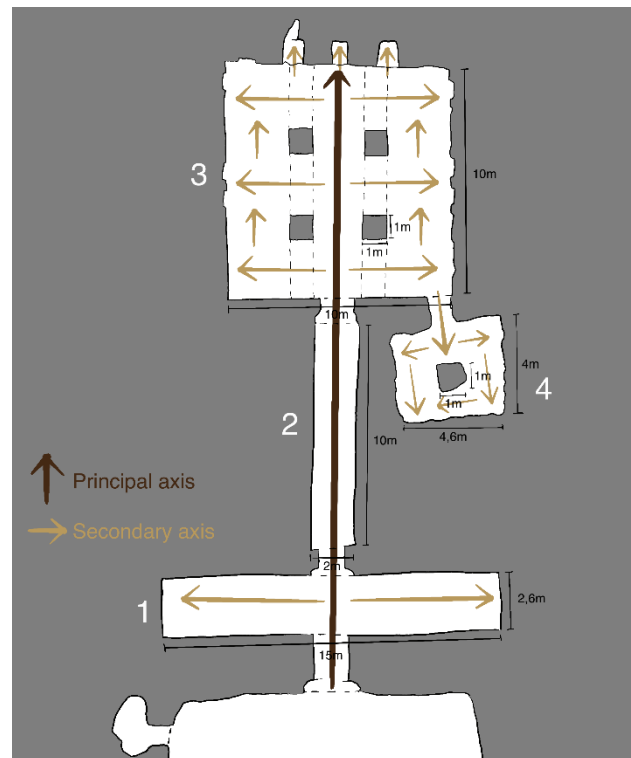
Plan with excavation axis of the Sennefer's chapel.
